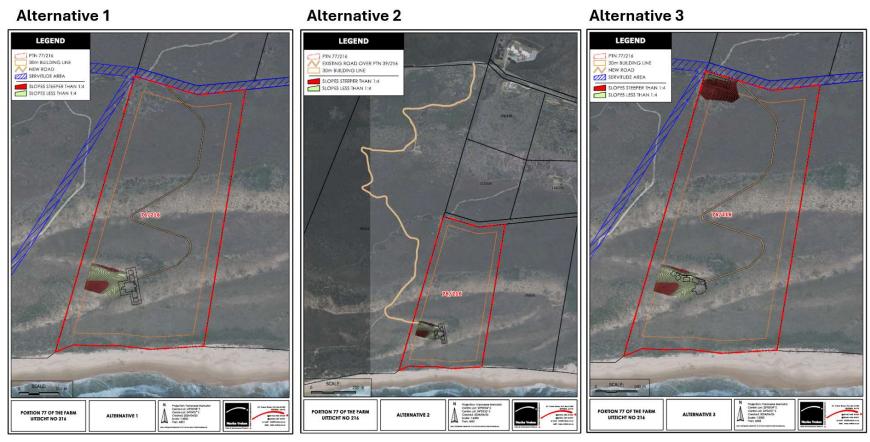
Maps of SDP Alternatives 1, 2, and 3 for Portion 76/216 Uitzigt Farm showing dwellings and proposed road options for accessing the building(s).
